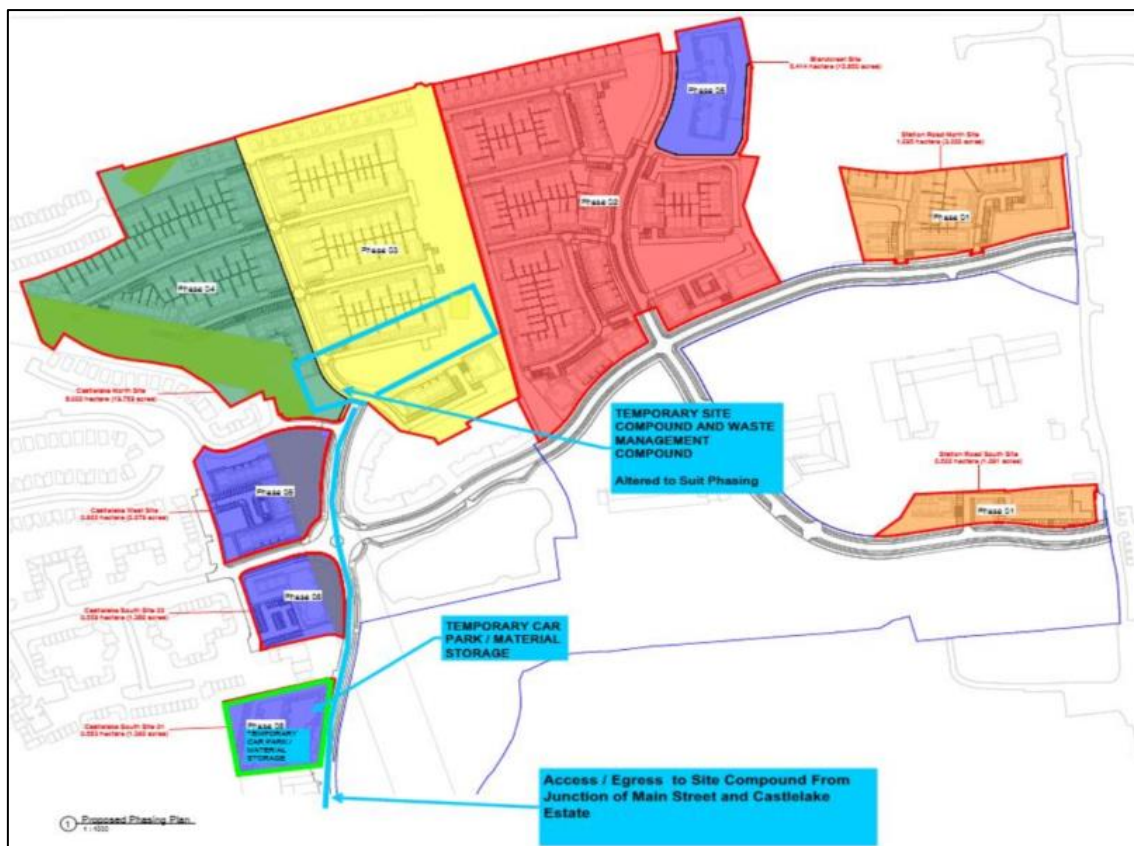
Proposed location of Construction Compound, car park and material storage area
